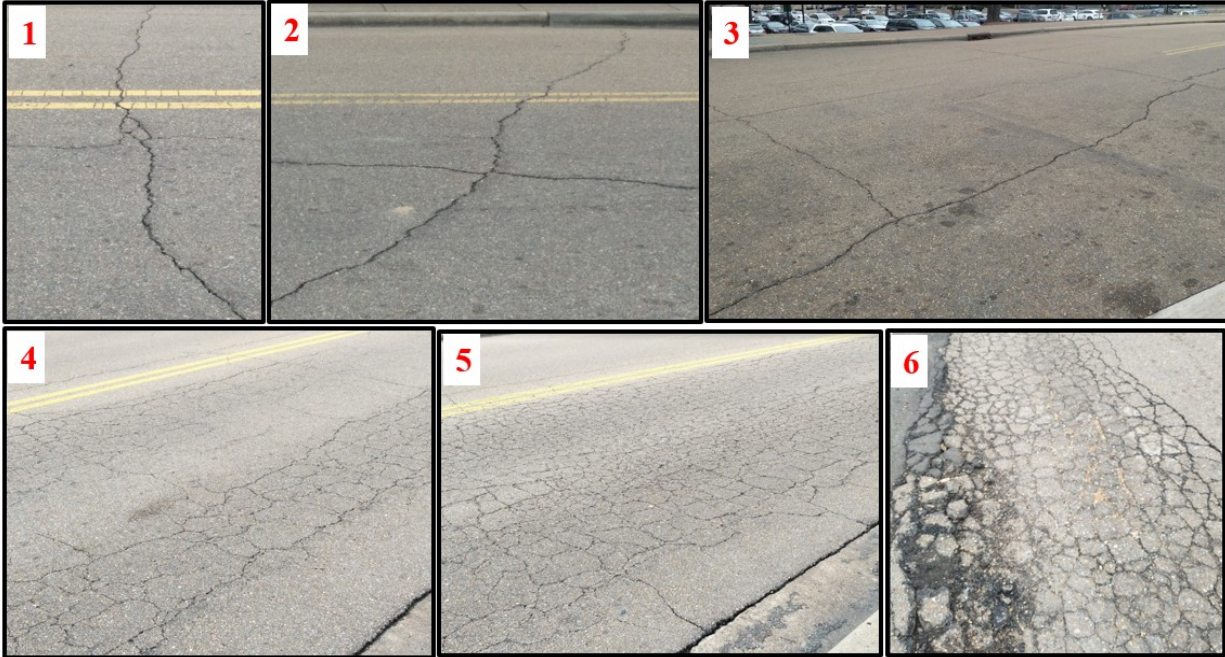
Typical crack distress types observed on asphalt surfaced road network
